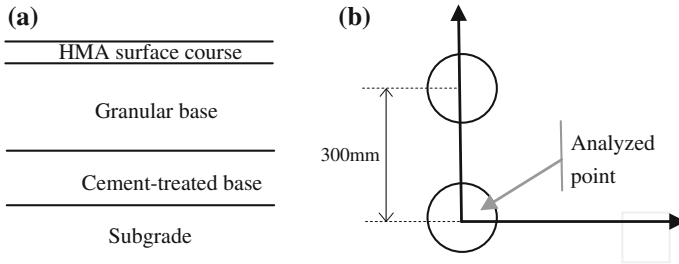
Typical upside-down pavement structure (a) and load applied scheme (b)
